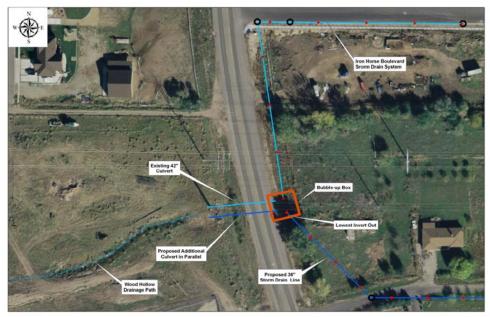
Proposed Bubble-Up Box configuration over one foot HRO aerial
